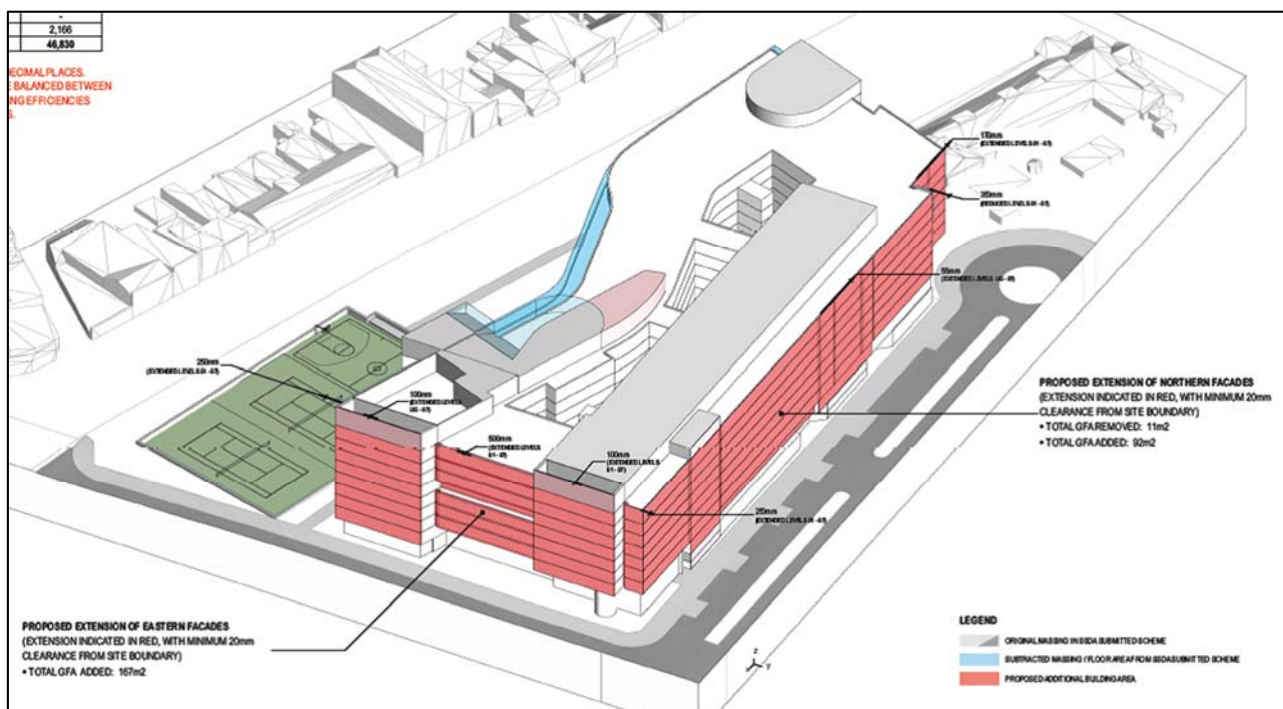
Concept diagrams showing area of Building 1 to be expanded in red (Source: applicant's additional information)
